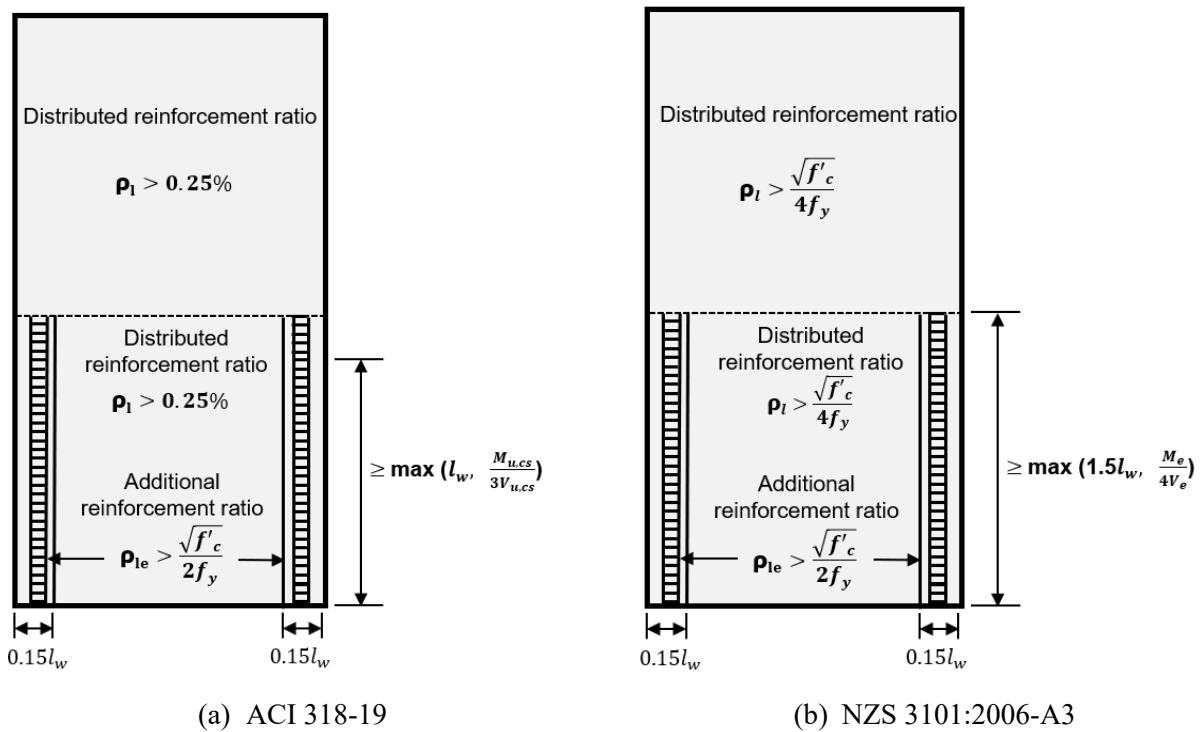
Comparison of the wall detailing requirement between the United States and New Zealand
